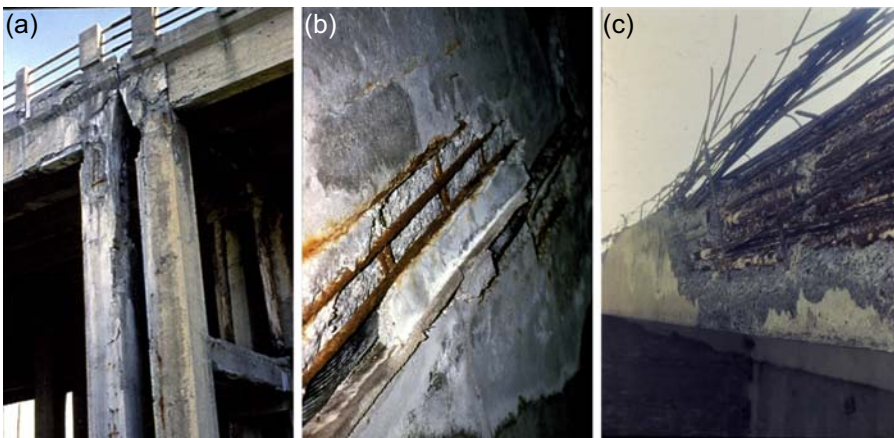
Example of chloride ion attacks on reinforced concrete and prestressed beams. (a) Attack of concrete due to a bad drainage of deicing salts running from the upper deck. (b) Corrosion of reinforcing steel in an indoor parking garage due to the progression of chloride ions dripping from the parked cars through the parking slab. (c) Attack of chloride ions on a prestressed beam.
